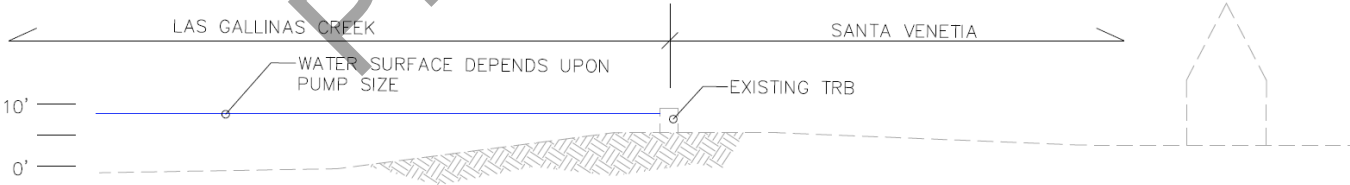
Cross Section through the South Fork of Las Gallinas Creek looking downstream
